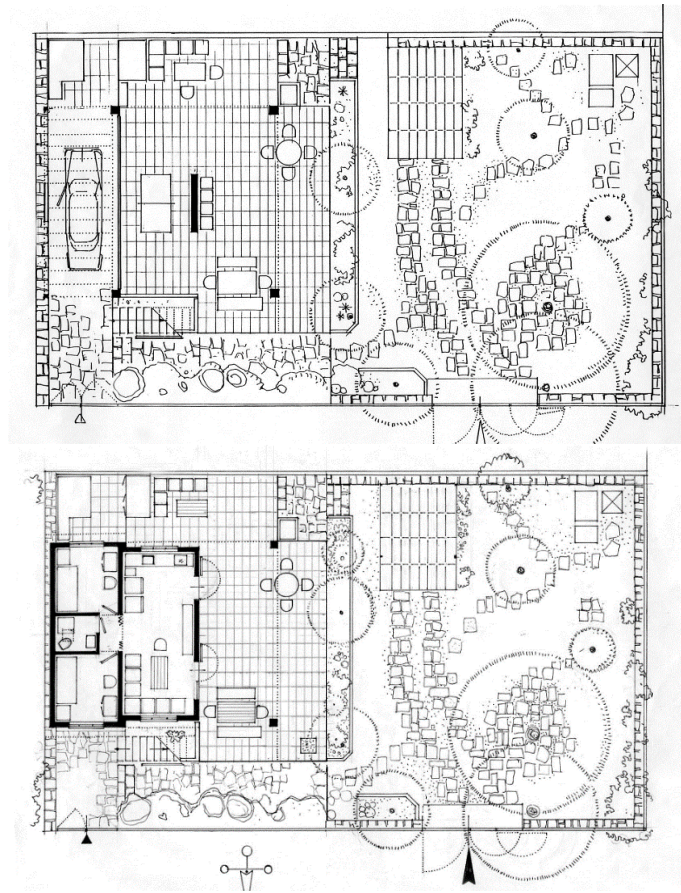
The renovated floor plans of Bayramoğlu Önal House after the construction of additional rooms on the upper floor
